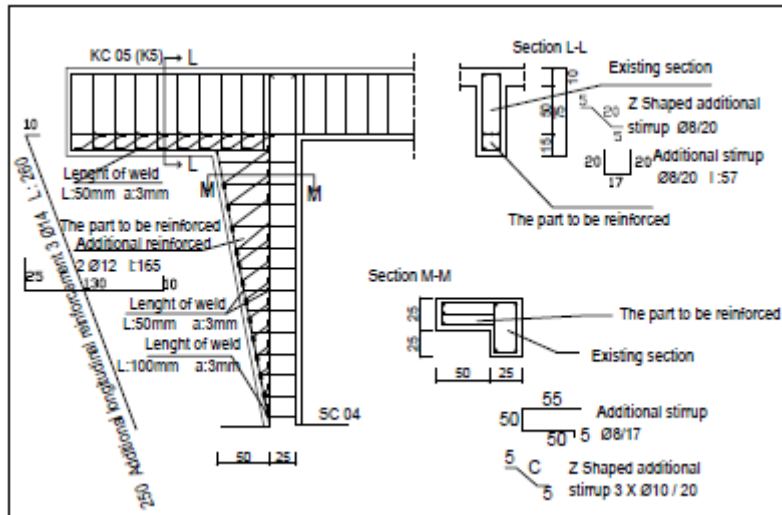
Unilateral reinforcement detail of SC04 column carrying a cantilever beam
